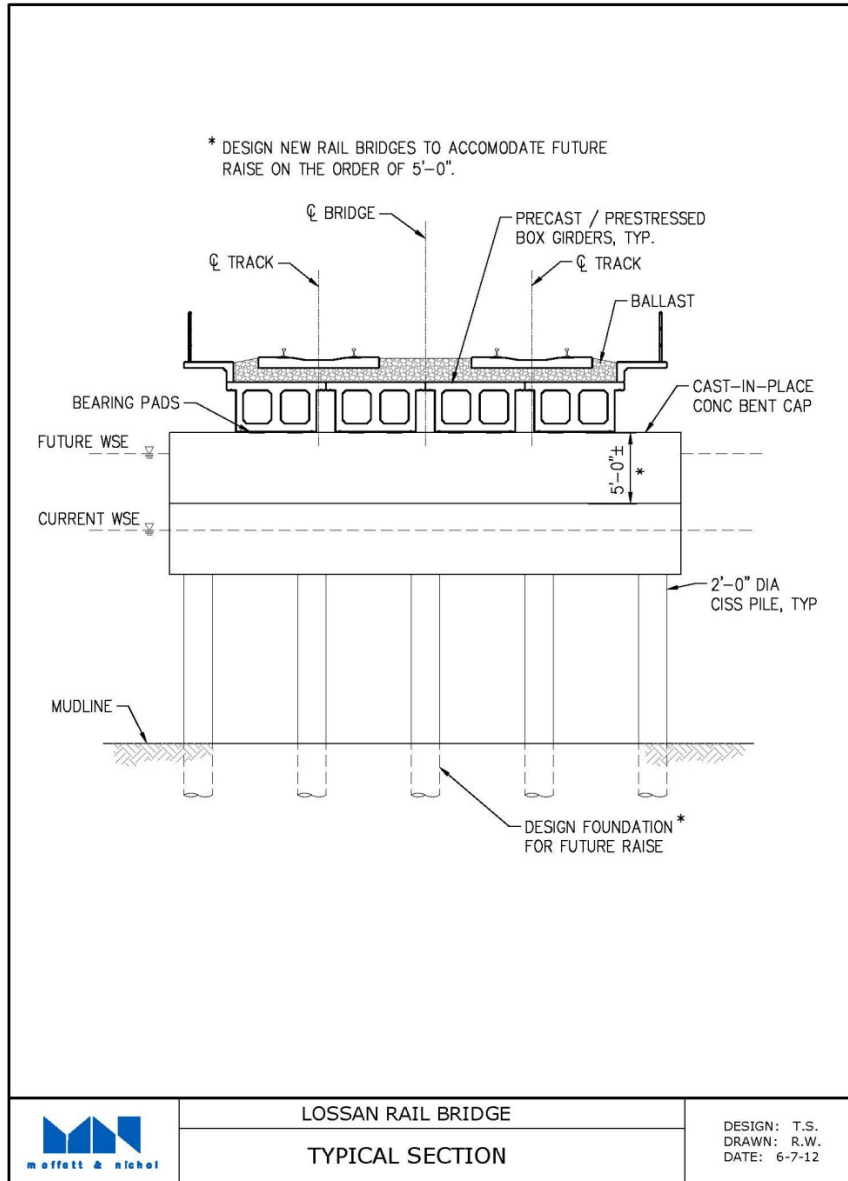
Typical Section of Adaptable Bridge Structure Concept
